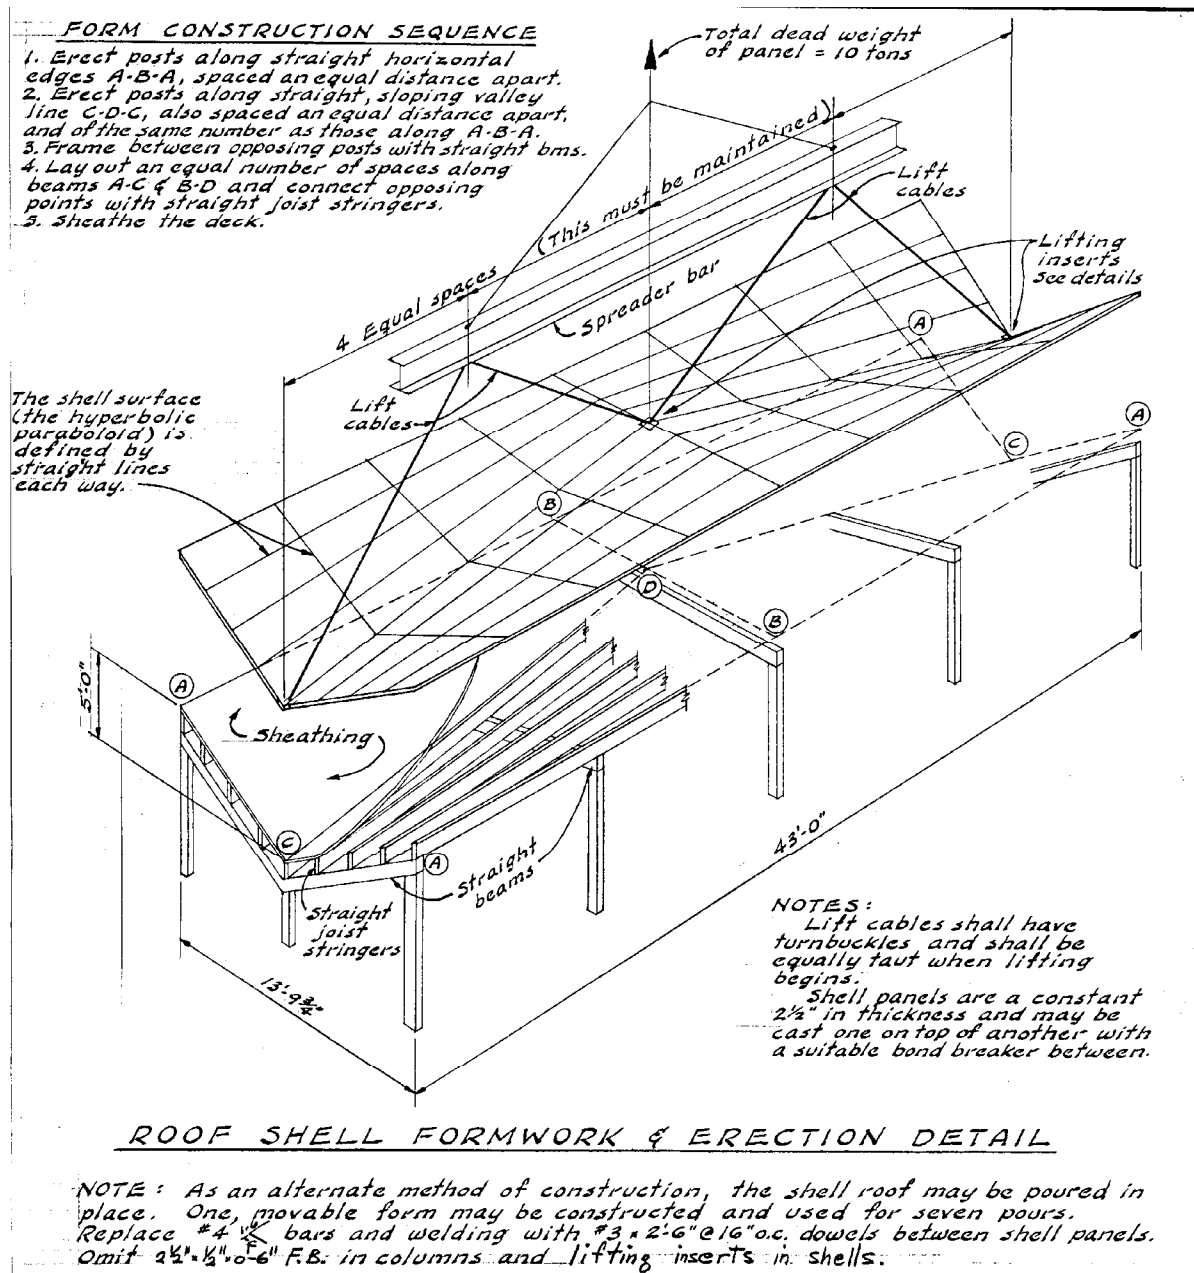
Roof Shell Formwork & Erection Detail - Construction Drawings - S-4 Roof Framing Plan
